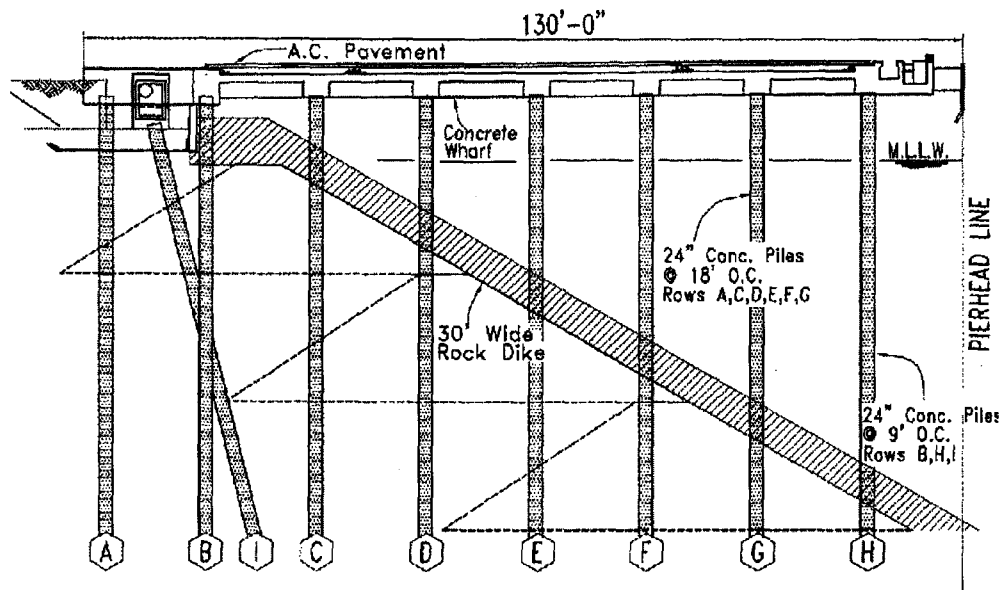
Typical section at the Port of Long Beach (Mukhopadhyay, 1989)
